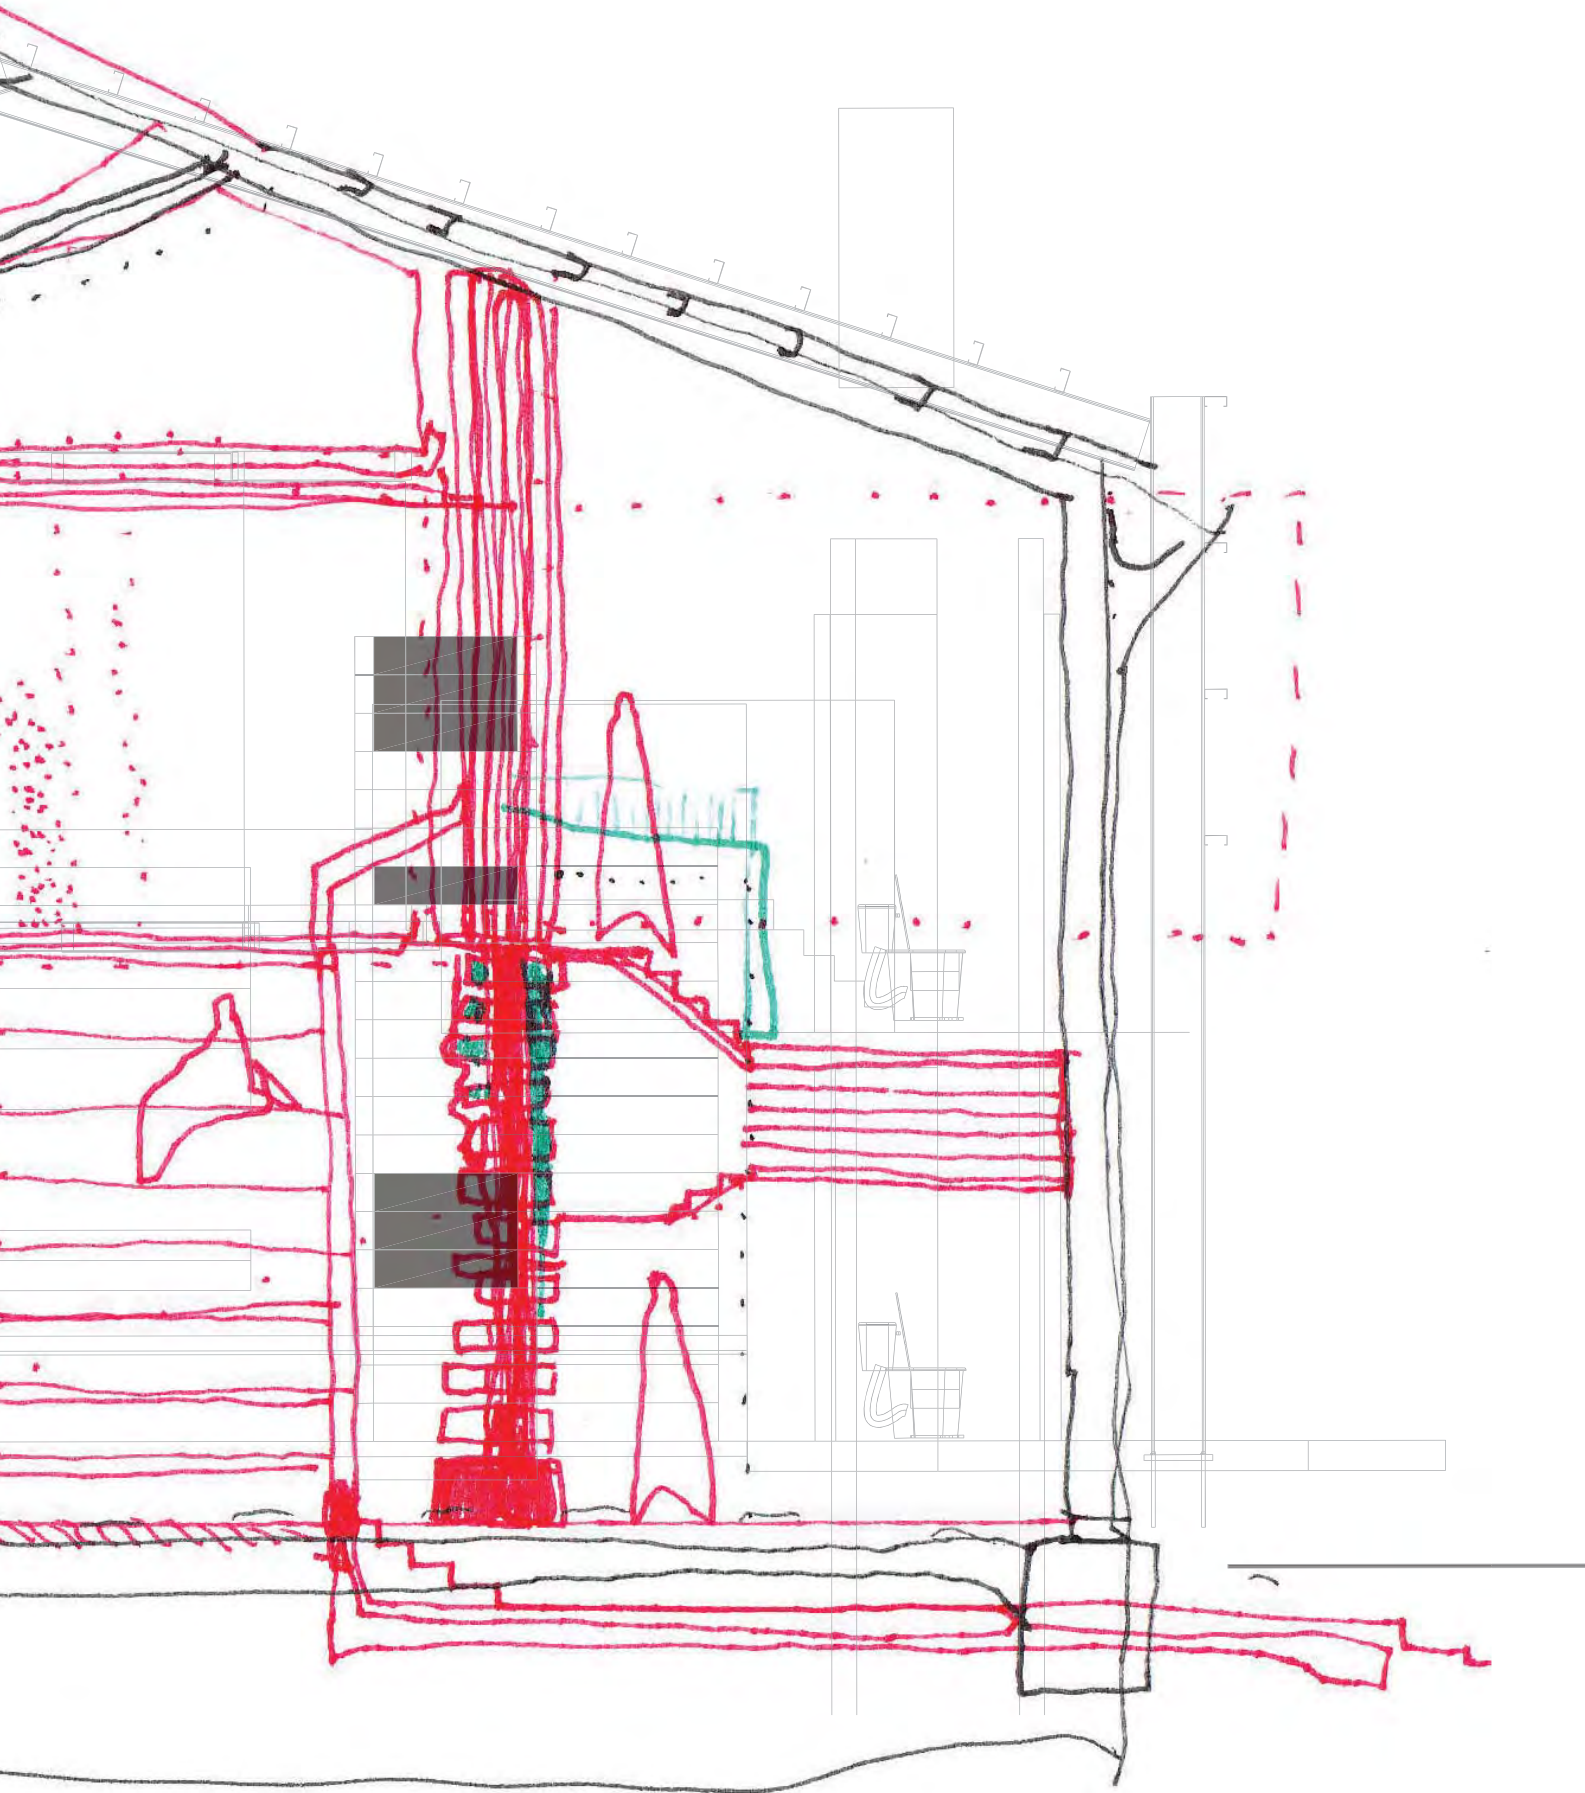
Section through the gallery and the role theatre space with tire wall construction and spolia brick.
